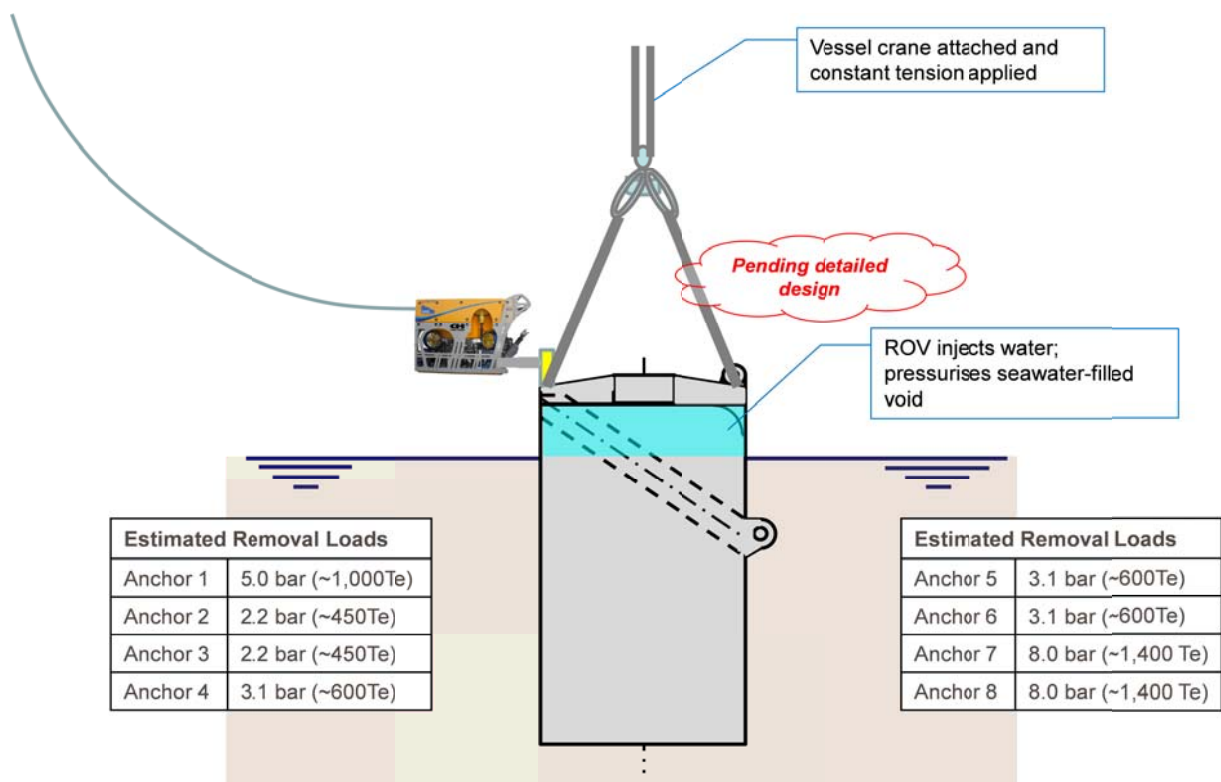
Suction Anchor – Reverse Installation Step 1
